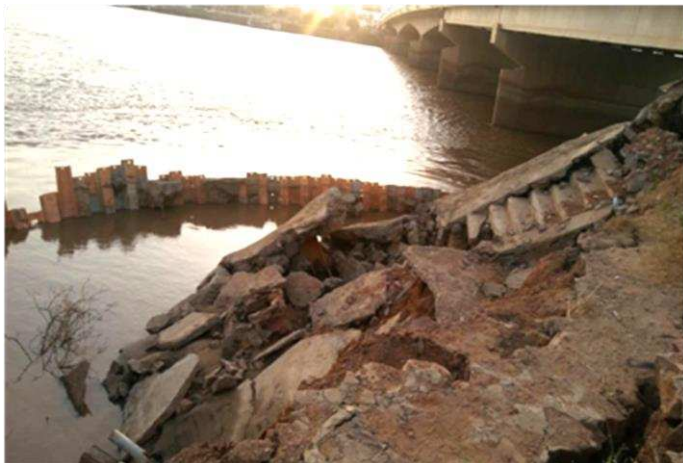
Serious failure and collapse of the protection around the abutment
